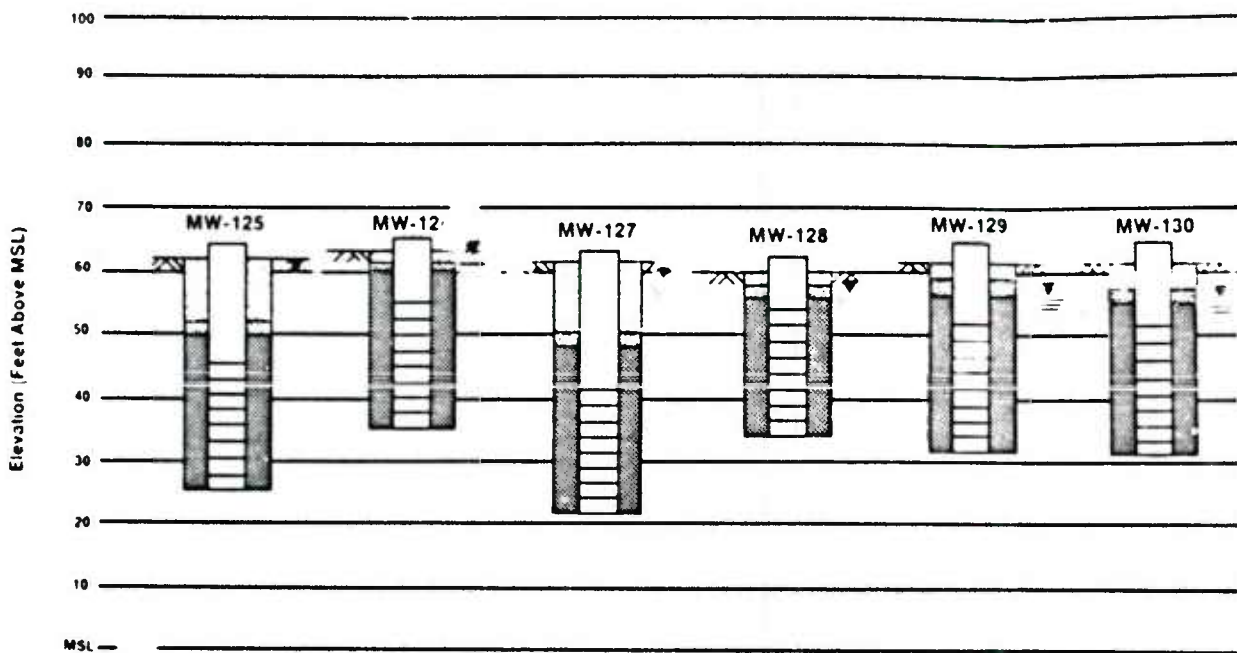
WELL CONSTRUCTION SUMMARY, STORM SEWER ZONE
